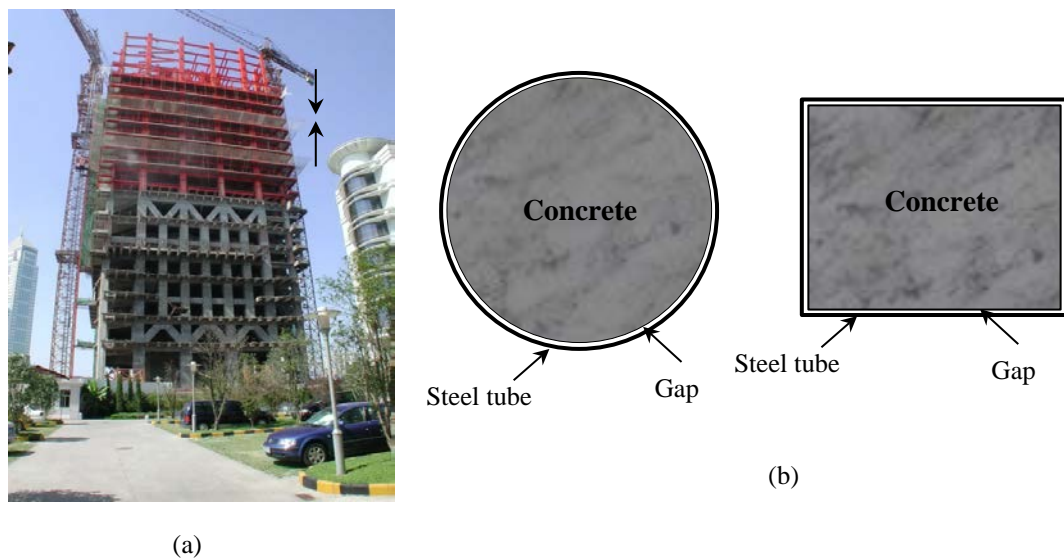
(a) Photograph of a high-rise building constructed with CFSTs, and (b) schematic of cross-sectional view of (left) circular and (right) rectangular CFST showing a circumferential gap between steel tube and core concrete (not-to-scale).
